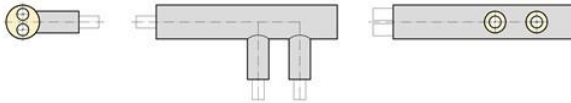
Transition fitting from TWIN PIPE to single pipe system – F type.
